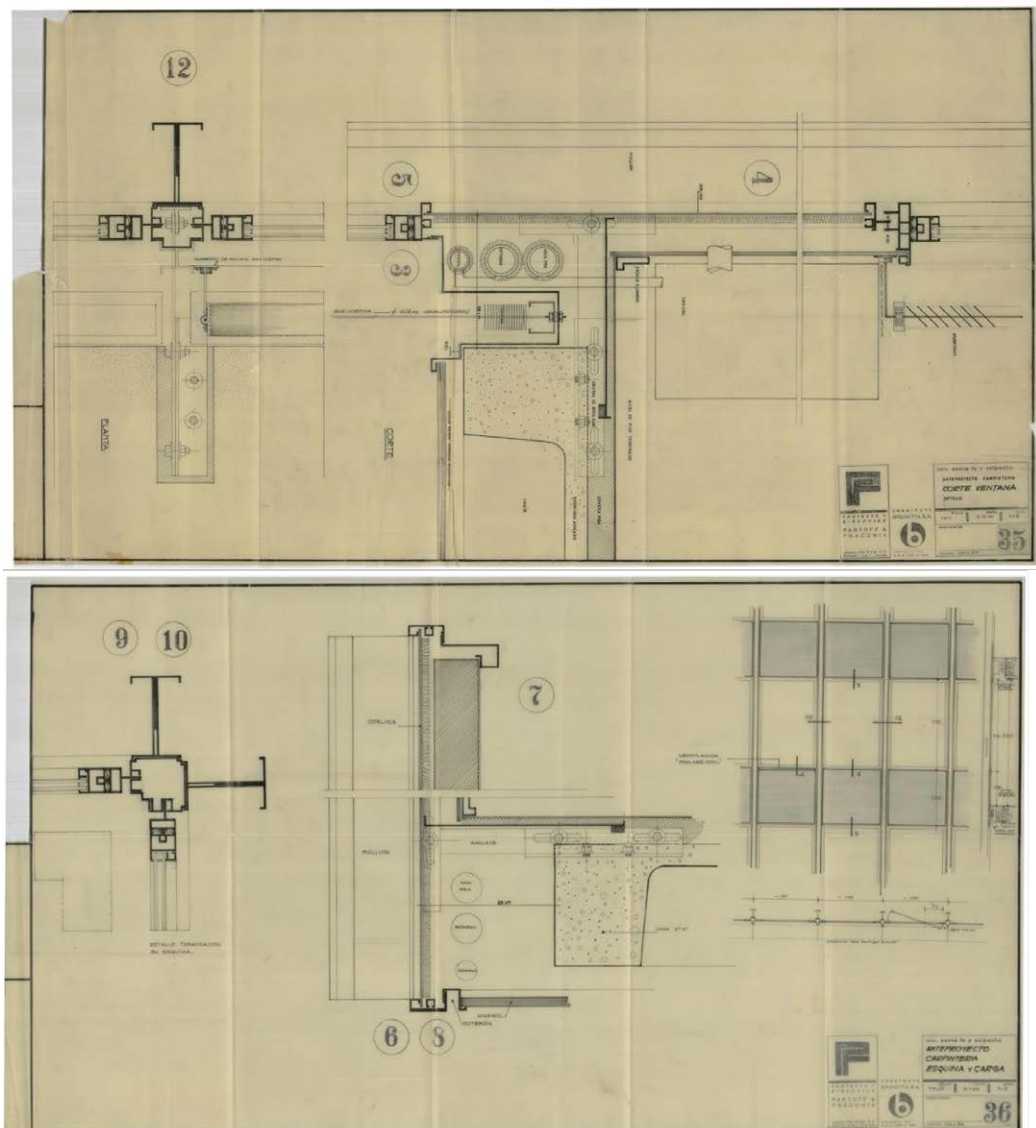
Archival detail drawings. Top: *CarpentryProject-Window Cutout-Detail*. Drawing by F.R.F. 3.12.61 - Esc. 1:2. Bottom: *Preliminary design carpentry-Corner and load*. Drawing F.E.L.O. 2.1.62 - Esc. 1:2.
